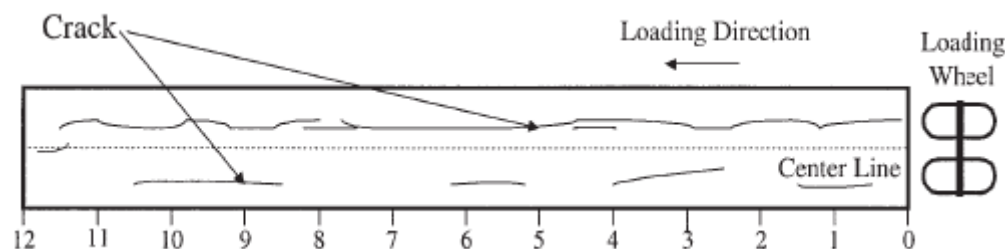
Top-Down Cracking Based on Accelerated Pavement Testing (Meng et al. 2004)
